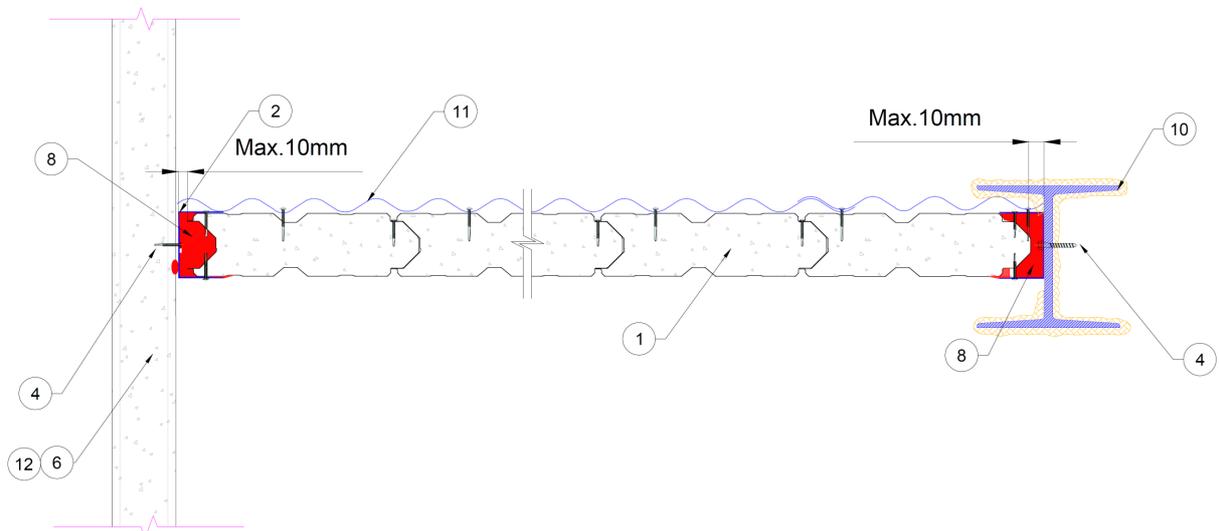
Speedpanel ceiling protected with plasterboard linings (Cross Section View)
